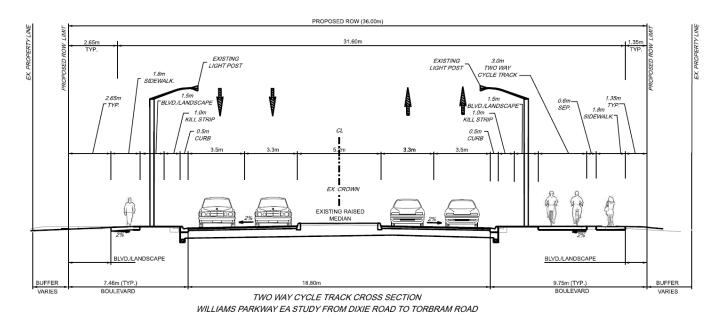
ALTERNATIVE DESIGN CONCEPT #3 - TWO-WAY CYCLE TRACK TYPICAL CROSS SECTION
